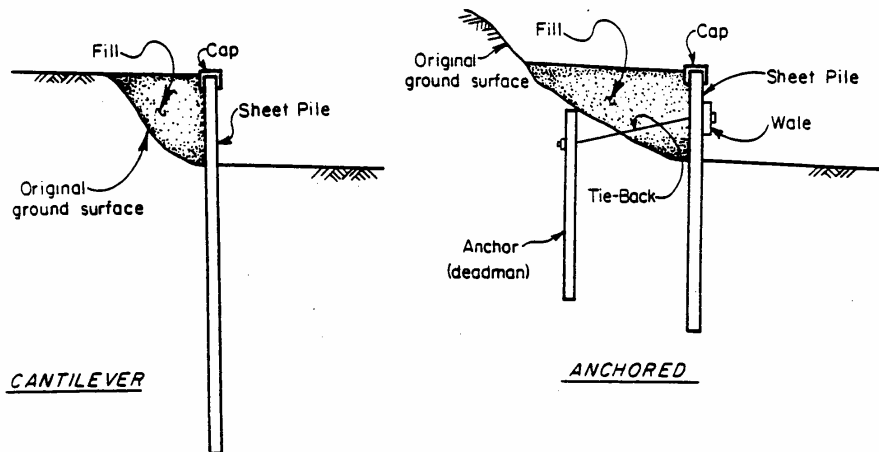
Cross section of a cantilever and an anchored seawall. If timber is used for the sheet piling, a filter cloth backing should be placed behind the timbers on the land side.
